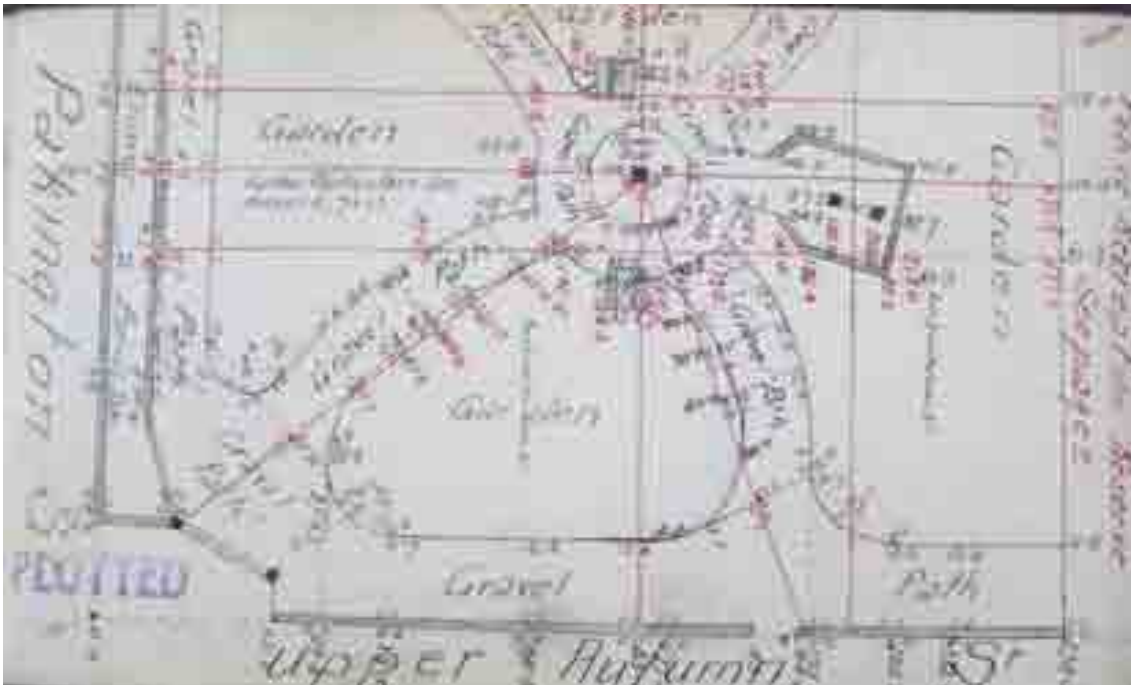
Sketch plan of the layout of a portion of the Geelong West Park, c.1912. Source: Geelong Waterworks & Sewerage Trust Fieldbook, no. 163, p.1, c.1912, Barwon Water collection.
